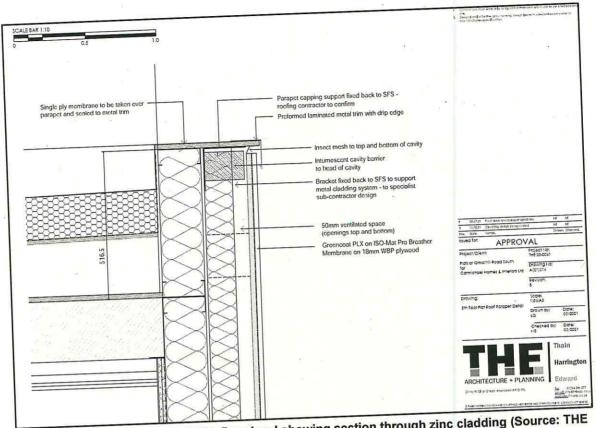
Typical wall detail at fifth floor level showing section through zinc cladding (Source: THE Architecture & Planning)
